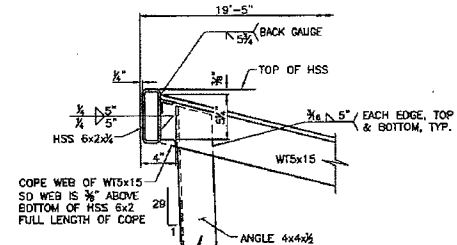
CENTER HATCH AND ADJOINING SIDES OF EAST/WEST HATCH
